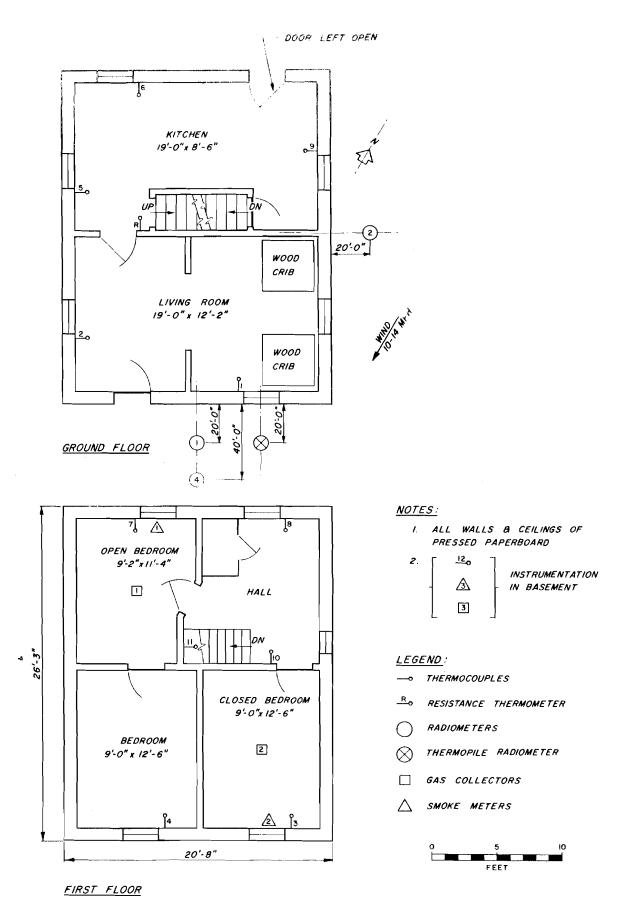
BUILDING No. 5 - TWO - STOREY WOOD FRAME DWELLING WITH CLAPBOARD EXTERIOR
